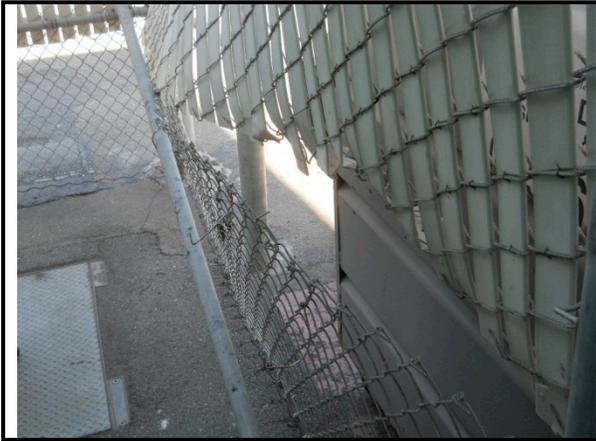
Damaged equipment enclosure fencing at rear exterior.
